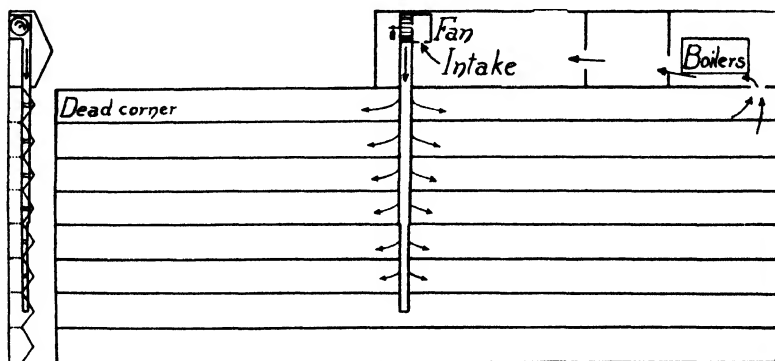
Plan of Darrow greenhouse forced ventilation
